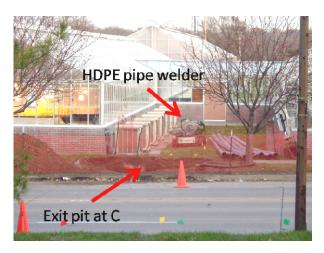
Looking east across Wallace Road toward exit pit at point C
